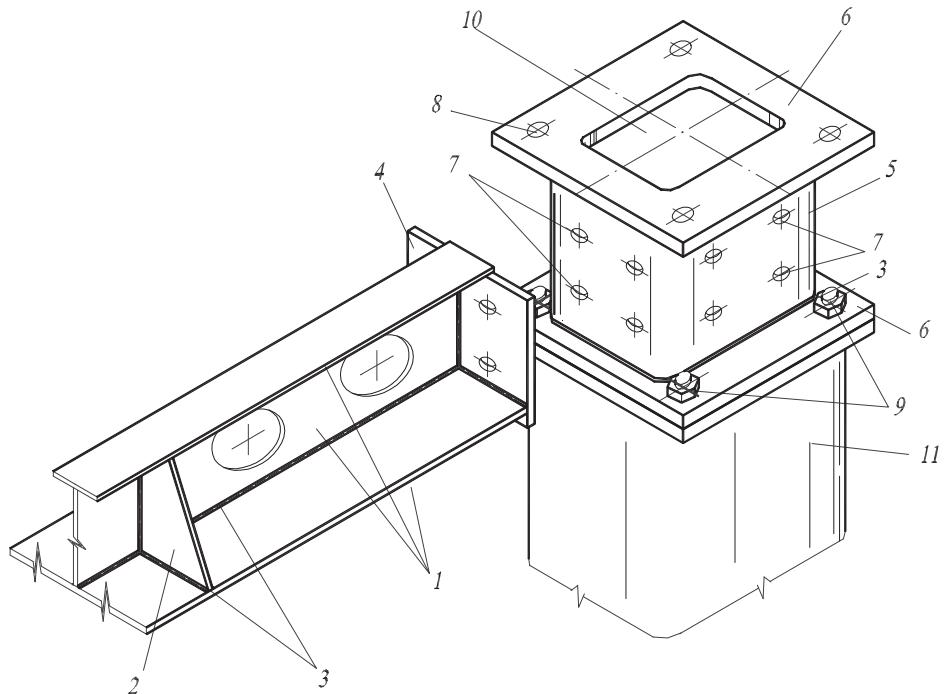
Connection joint between steel welded beam of the bearing girder and column: 1 – steel beam, 2 – stiffening rib, 3 – welded seams, 4 – end face flange of the beam, 5 – joint element, 6 – joint element flange, 7 – bolt openings for fixing steel beams, 8 – bolt openings for fixing columns, 9 – bolts, 10 – through opening for supply of cast-in-situ concrete in the body of column and joint element, 11- column.
